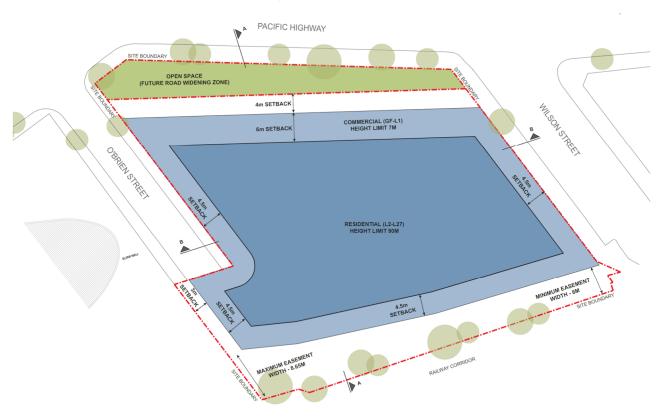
Site Specific DCP controls for Building frontage, heights and setbacks. (Source: PBD Architects)
